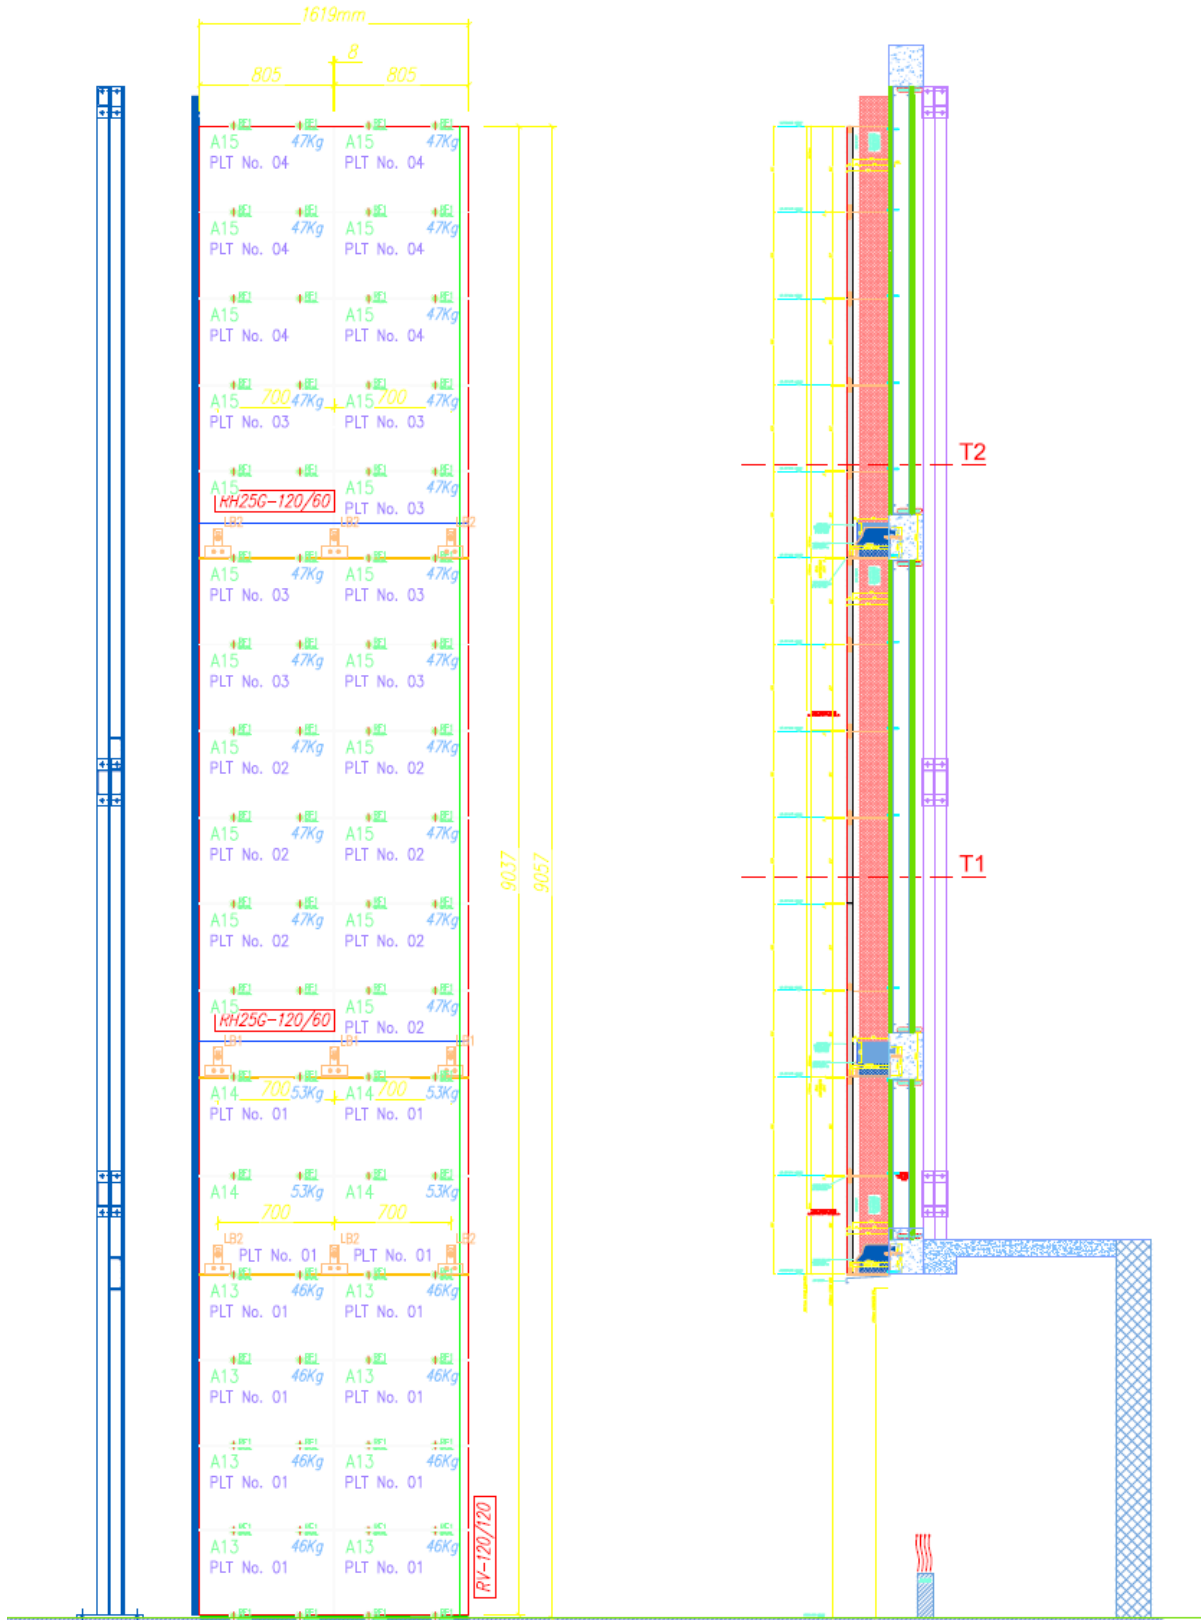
Sketch of the tested facade. Side elevation and Section layout.
